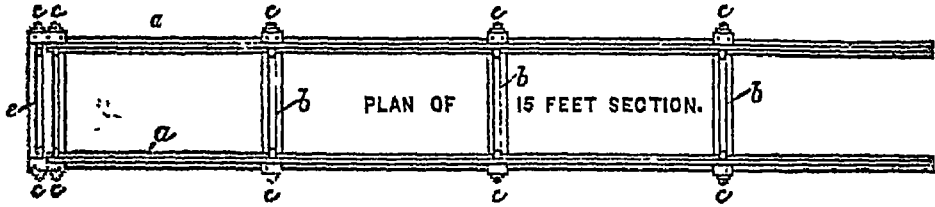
shows in plan a section of a portable railway suitable for manual or animal power; a, a are the rails in plan; b, b the single and c, c the double sleepers; c, c are the hook-bolts which fasten the rails to the sleepers.
